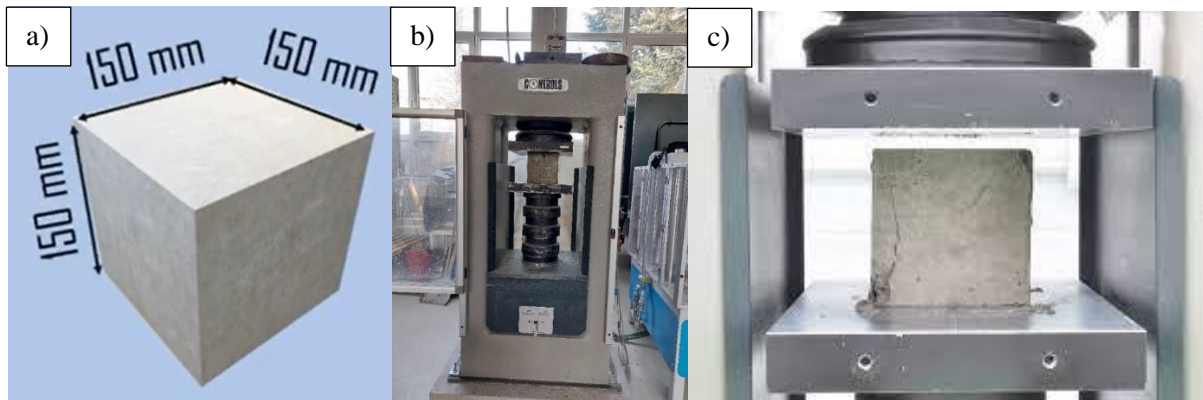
Compressive strength: a) dimensions and shape of concrete sample; b) digital hydraulic press with 3000 kN capacity; and c) testing of the concrete specimen.
